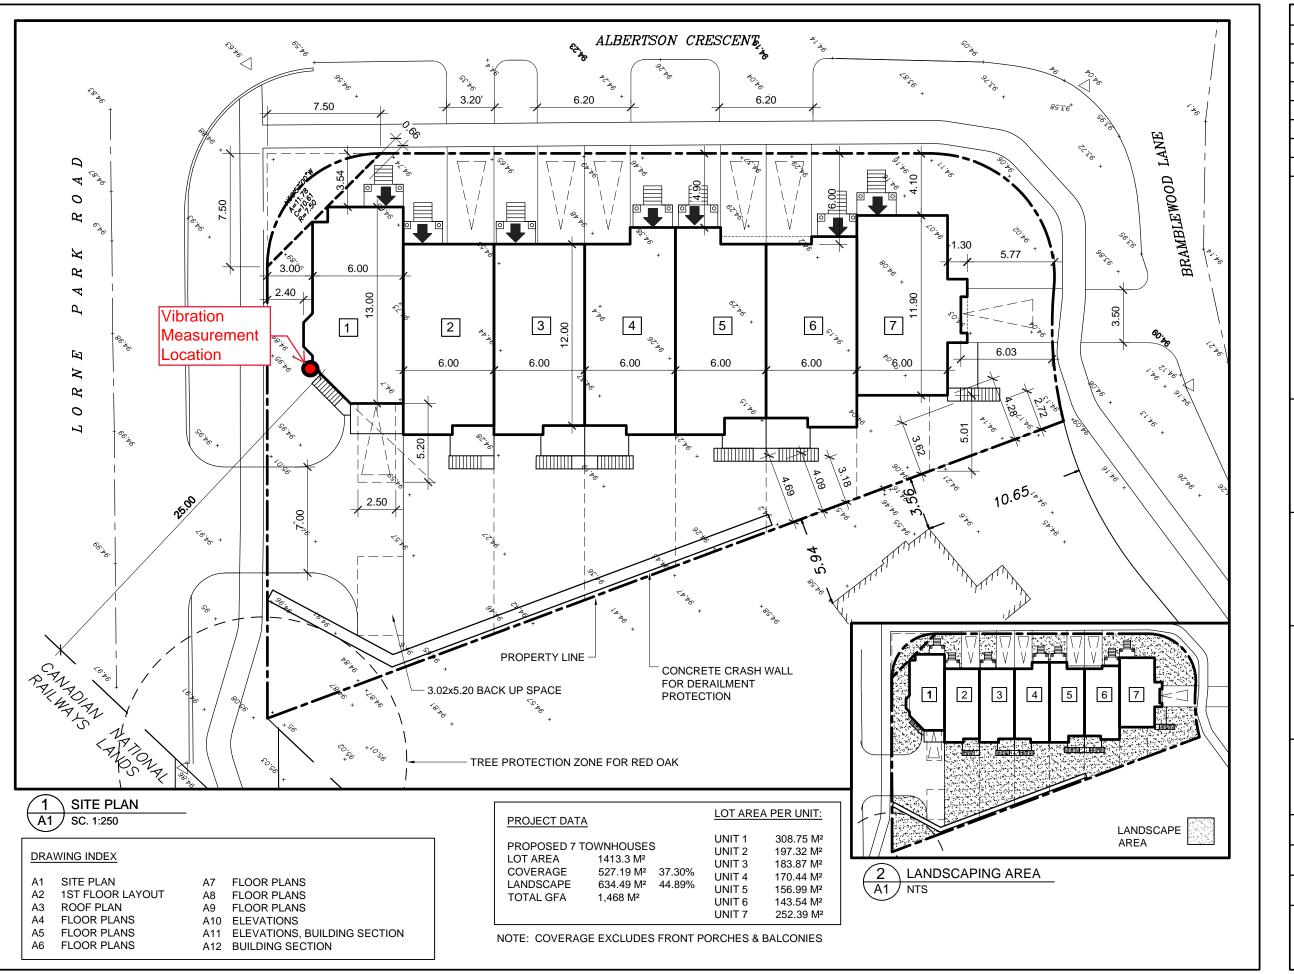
Proposed Site Plan Showing Vibration Measurement Location
